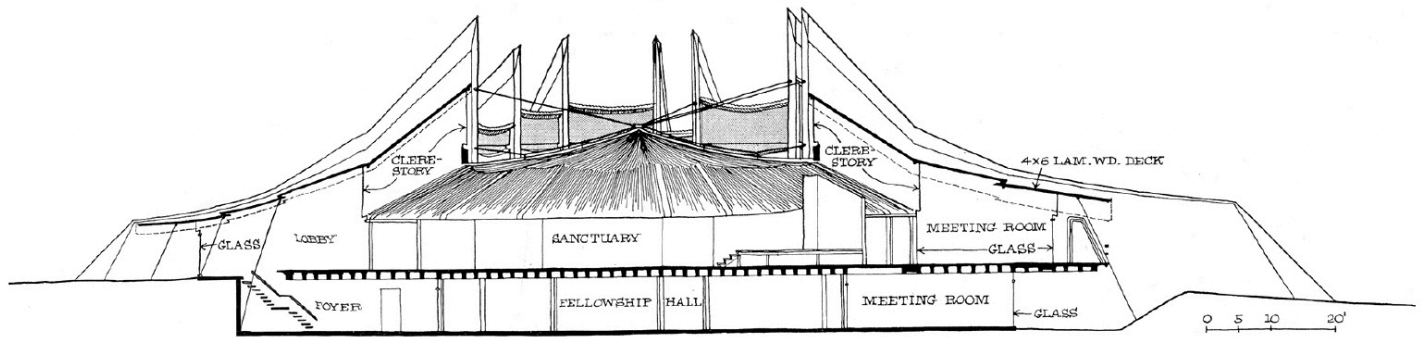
of 13. Schematic section, illustrating the relationship between the clerestory windows and the wood roof decking. "Connecticut Prayer Tent." *Architectural Forum*.
